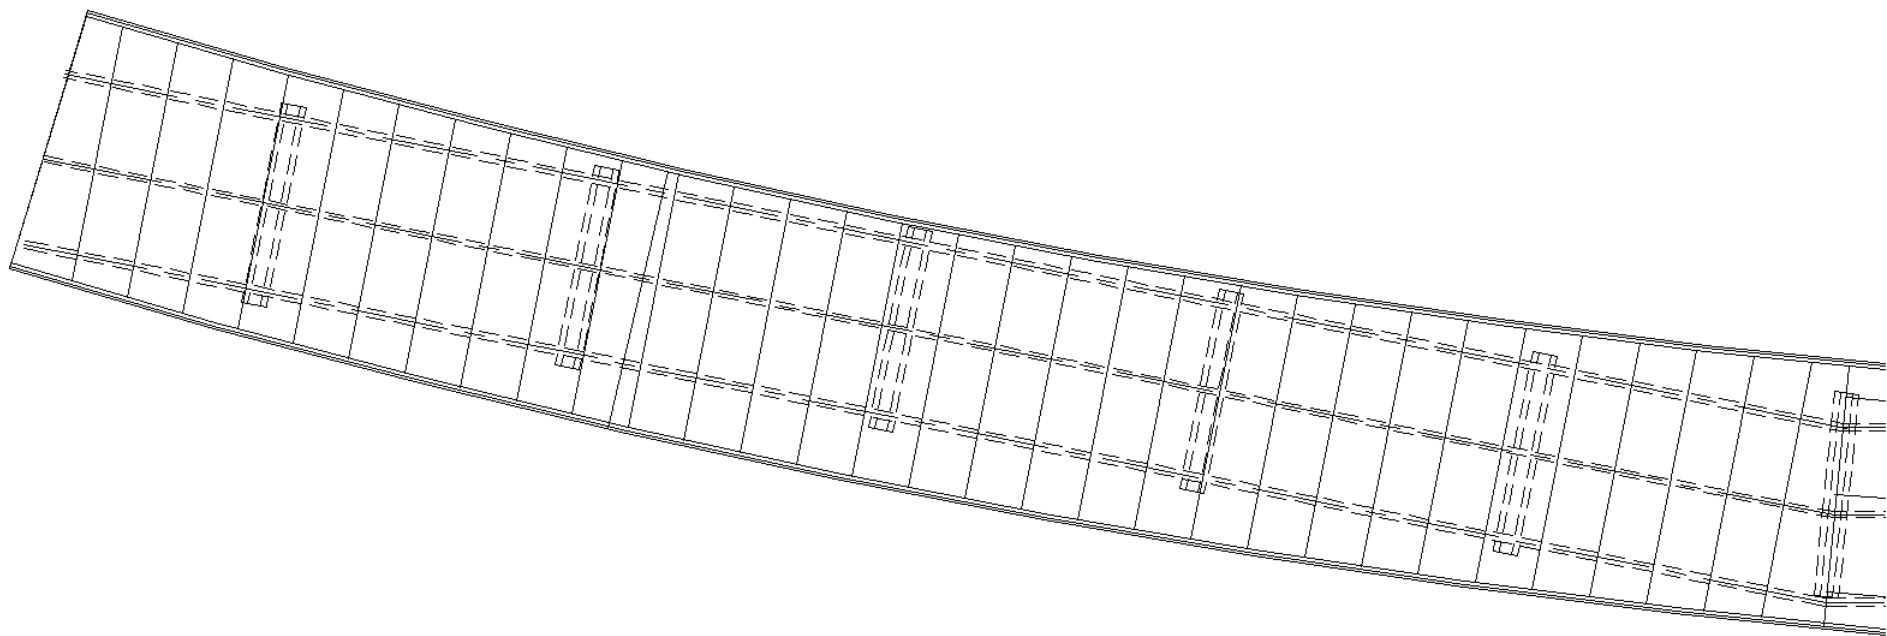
Drawing K: BRIDGE PROJECTS, 6104-SP TO BUCA\CN\LB-S2.DWG Layout Tab SHEET 56
